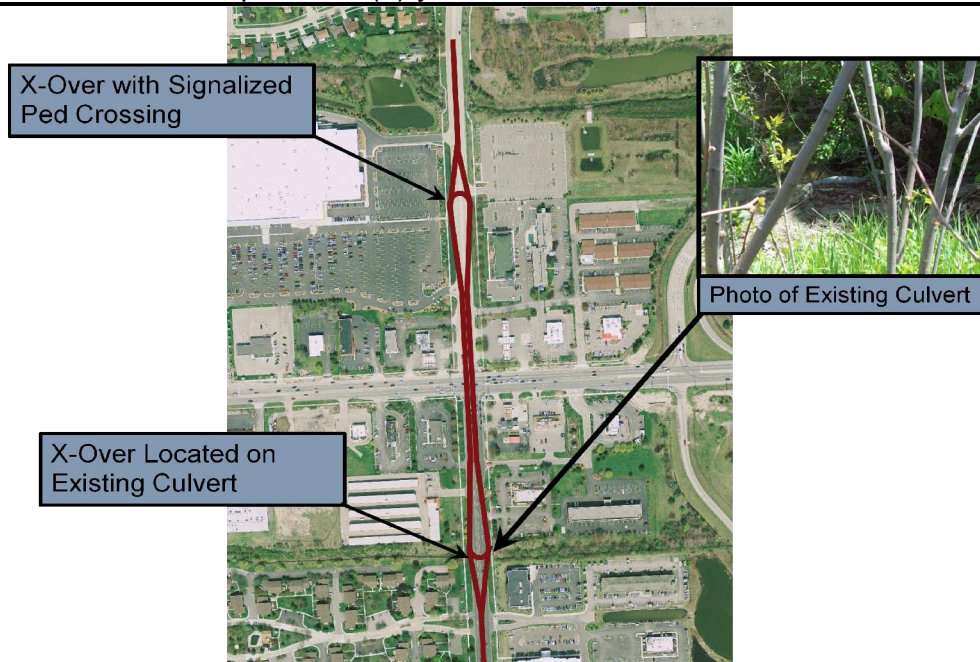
Potential Boulevard Section on Haggerty Road at M-153
